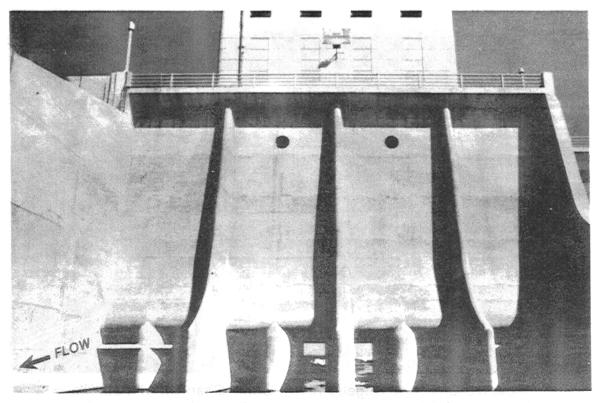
Outlet Works (center gates fully open) (view from channel downstream).
